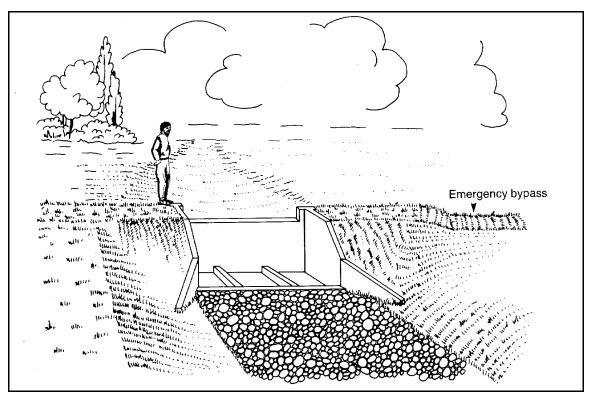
Reinforced concrete drop spillway for grade stabilization with emergency bypass and downstream protection (Source: North Carolina Erosion Control Manual)
